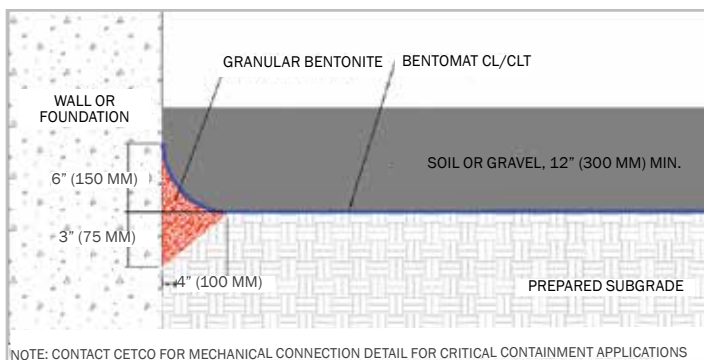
Termination of the liner at a structure embedded in the subgrade.
